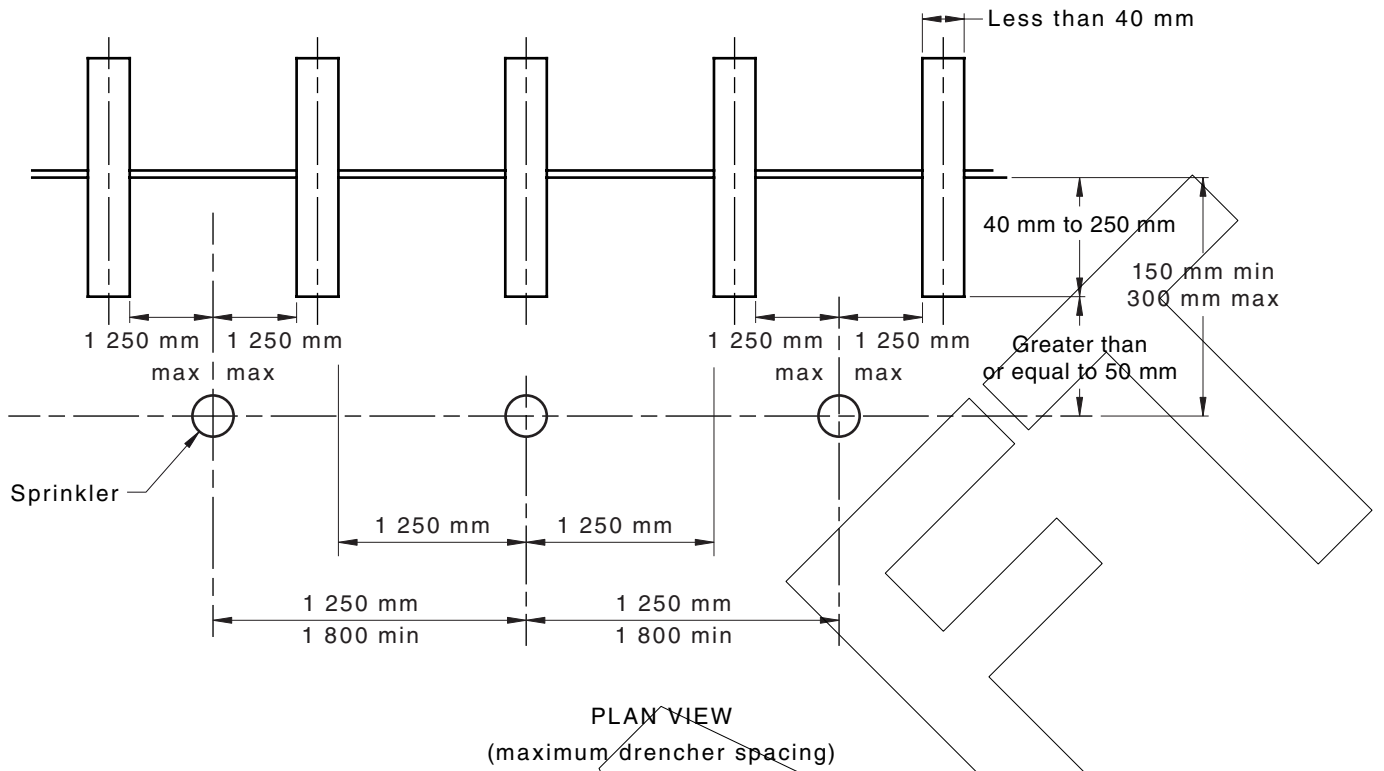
(A) — Spacing of sprinklers for vertical glazing bars or mullions less than 40 mm in width projecting more than 40 mm but not greater than 250 mm from the opening infill surface
